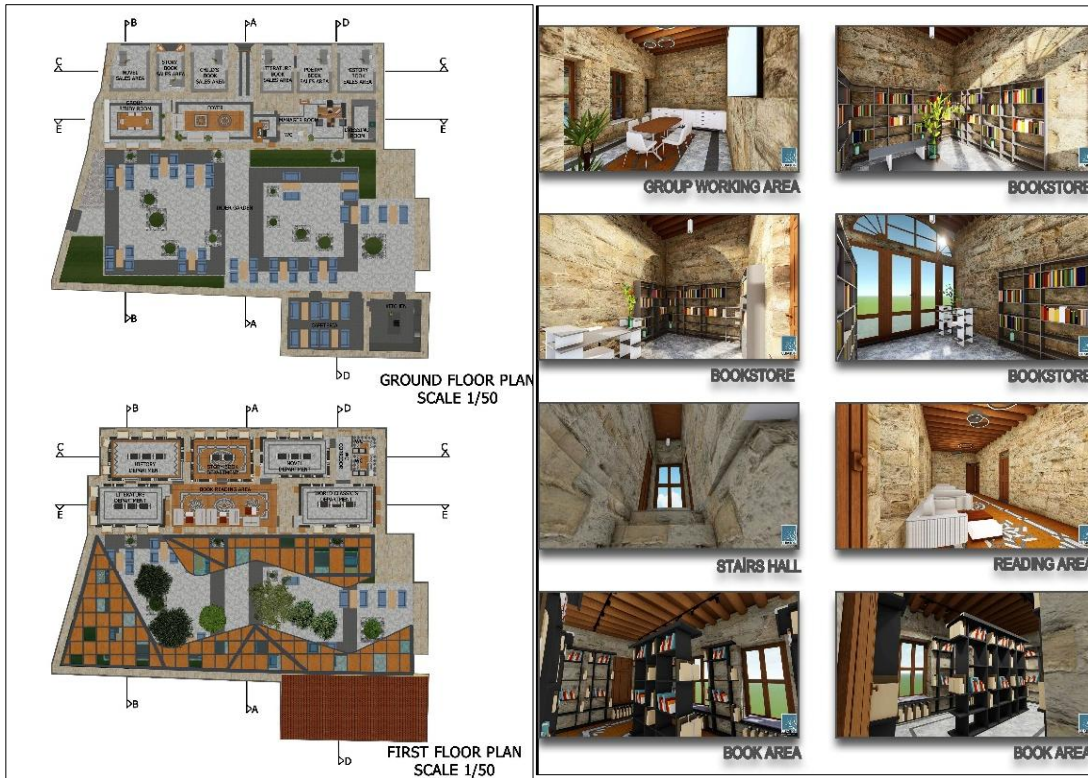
Proposal 3- book store&cafe- (a) plans (b) 3d views
